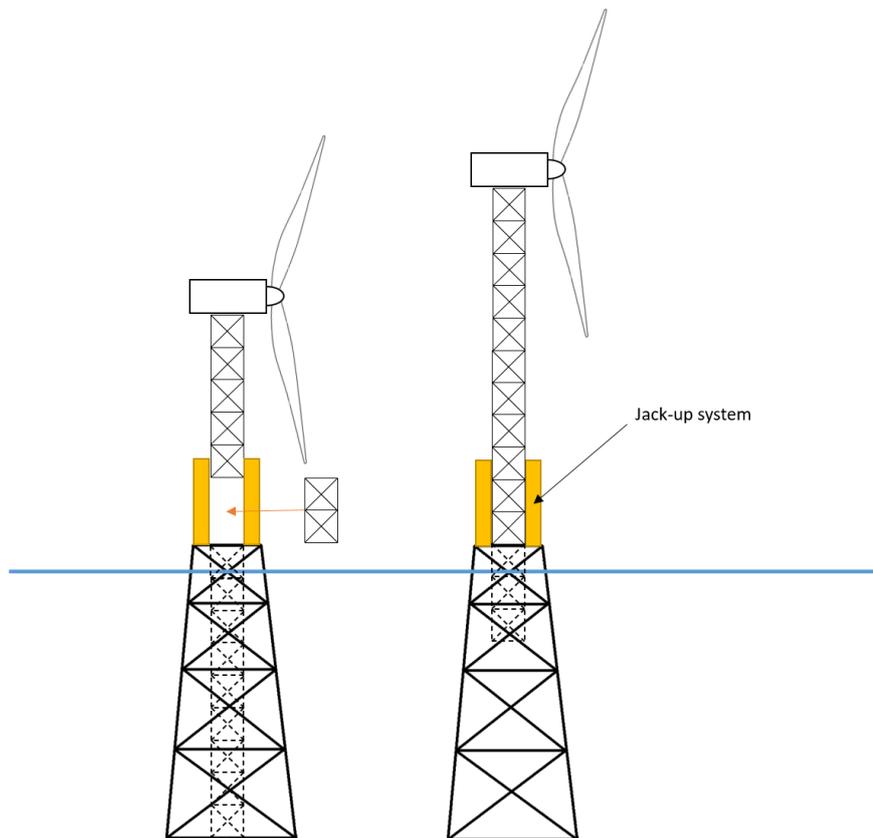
Sketch of workings generated concept 11, Jack-up leg tower principle.
